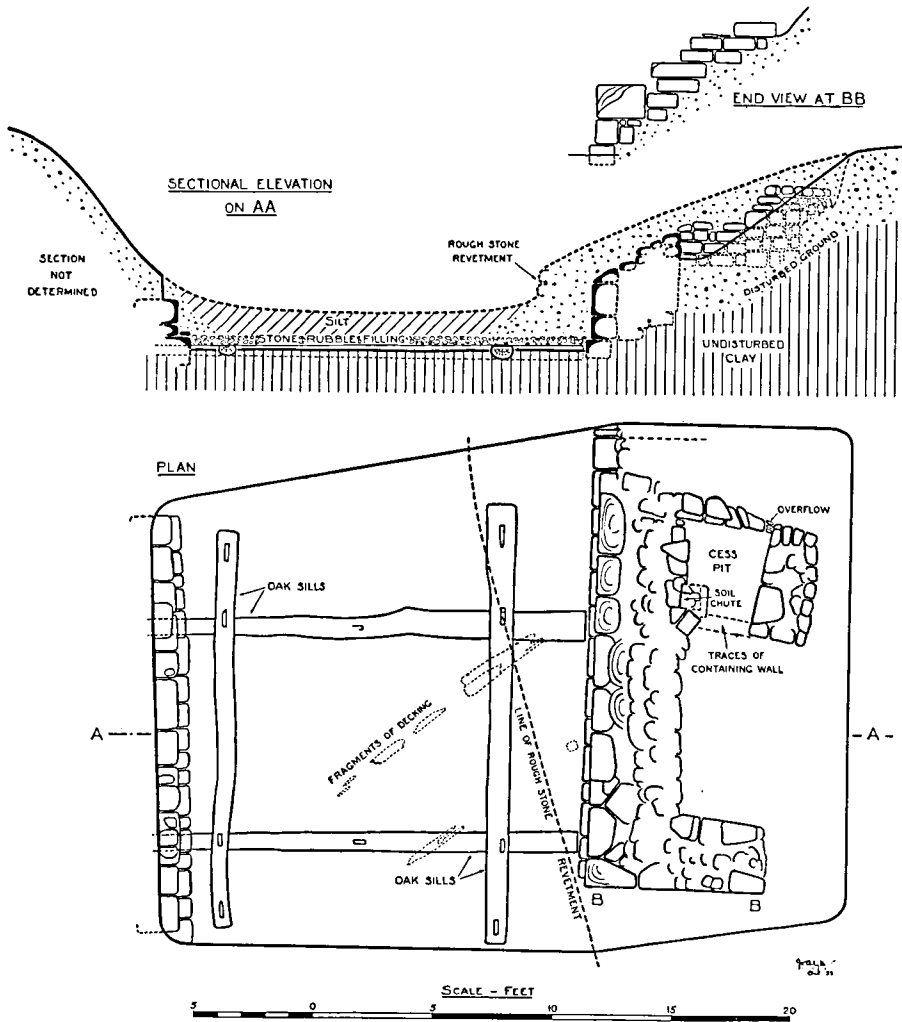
Detail Plan and Section showing remains of Bridge and Abutments at A1 on General Plan
